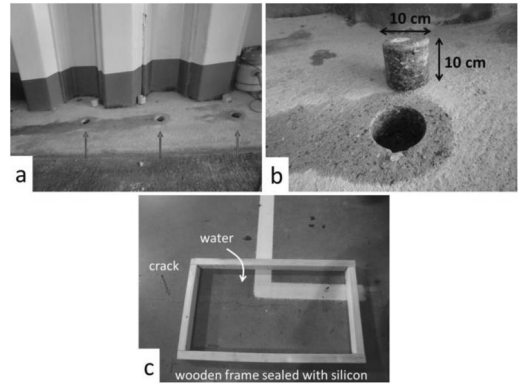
Evaluation of the repair system's efficiency. (a) cores drilled on the concrete pavement, (b) detail of a core, (c) water permeability testing.
